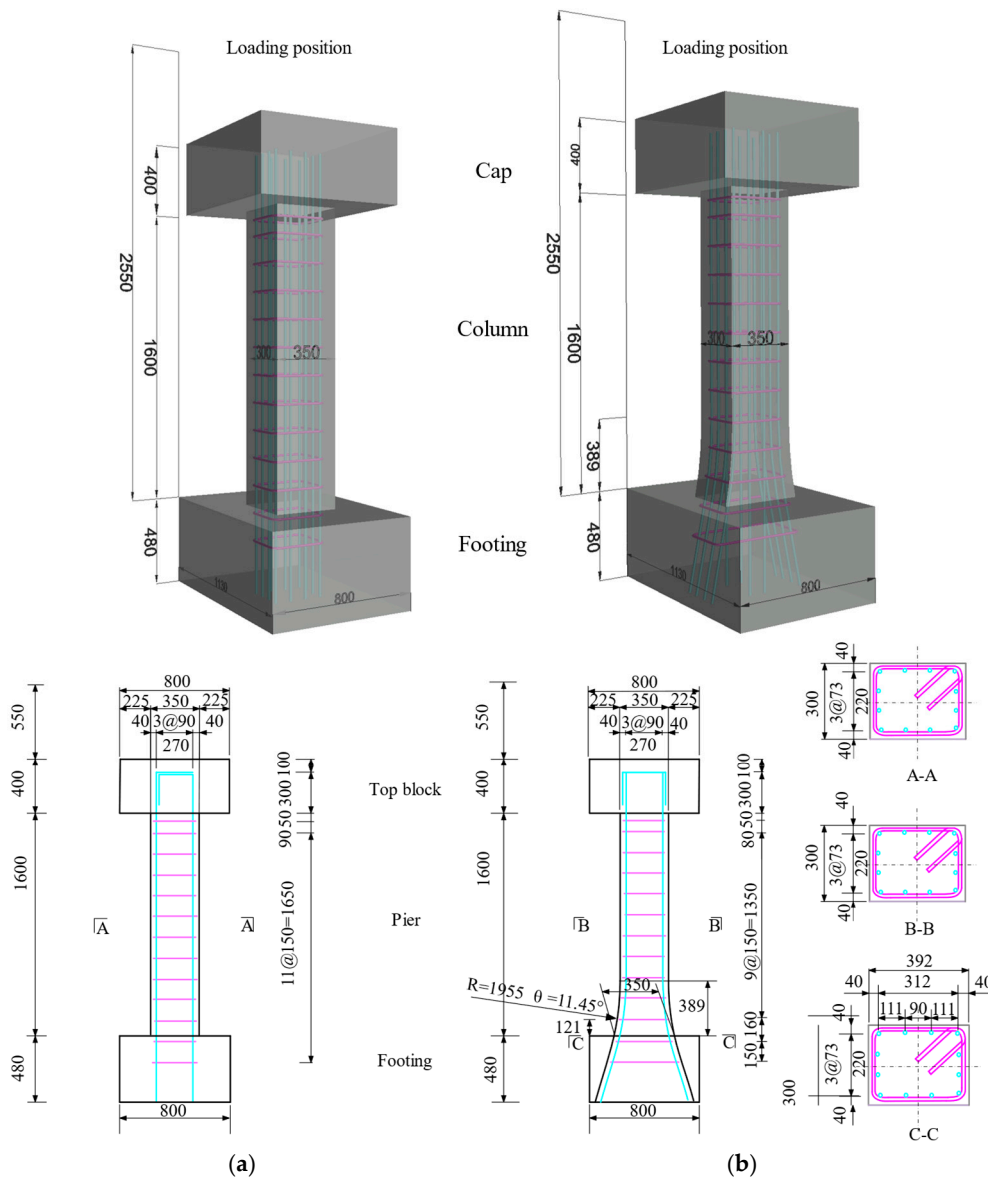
Schematic diagram of reinforcements (unit: mm): (a) Type 1 and (b) Type 2.
